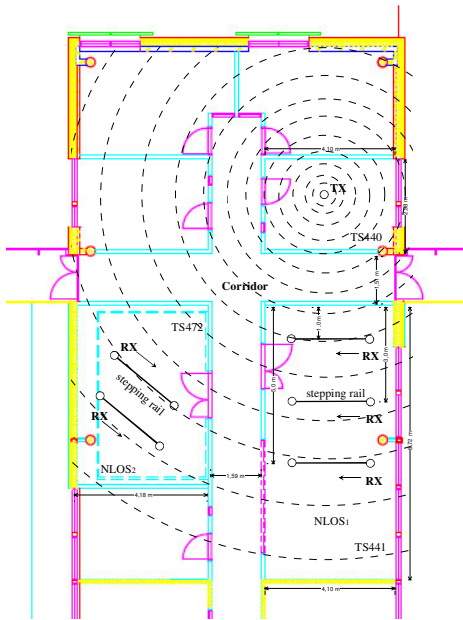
Floor plan of the office building (Tietotalo), where the channel measurements were carried out.
